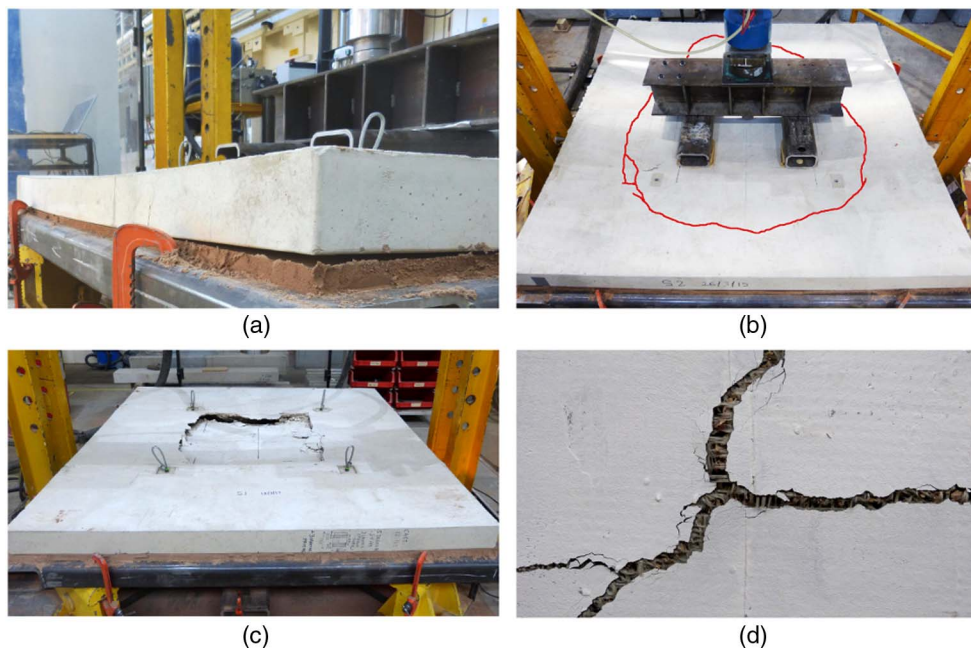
(a) Corner uplift, CON slab; (b) circular-shaped crack at the top of the CON slab; (c) slab C2 failure in punching shear; (d) partial rupture and slippage of the fibers within the matrix along the cracks on the TRM face, G3 slab
